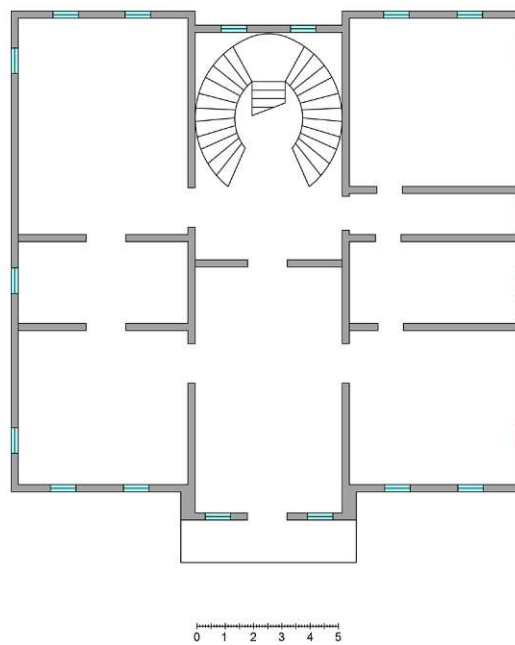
House of Dr. Stoyan Chomakov – first floor plan
